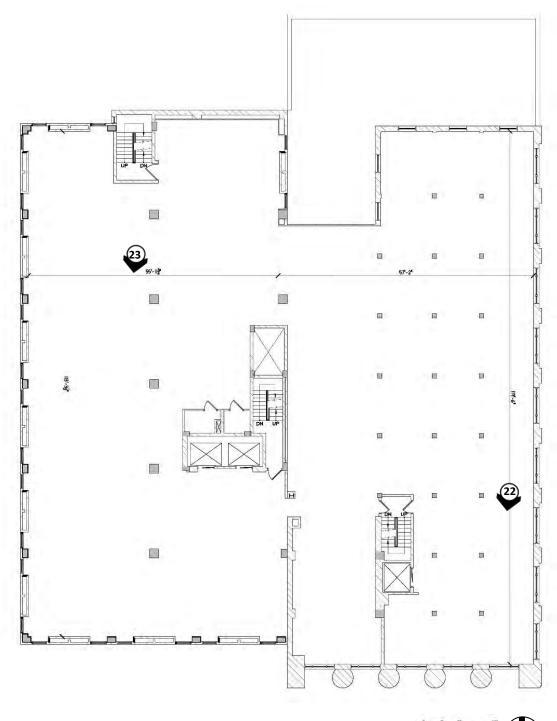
Existing Floor Plans and Photograph Keys – 3rd Floor
